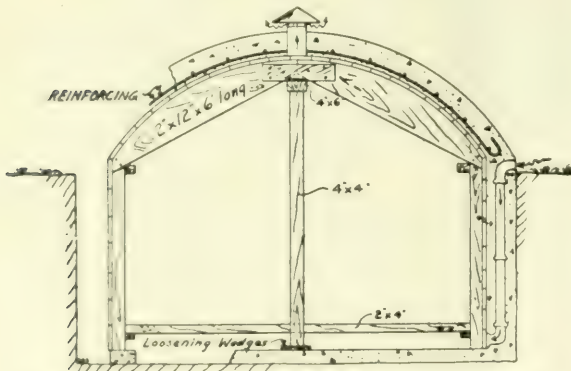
Framework for constructing outdoor storage cellar of concrete
